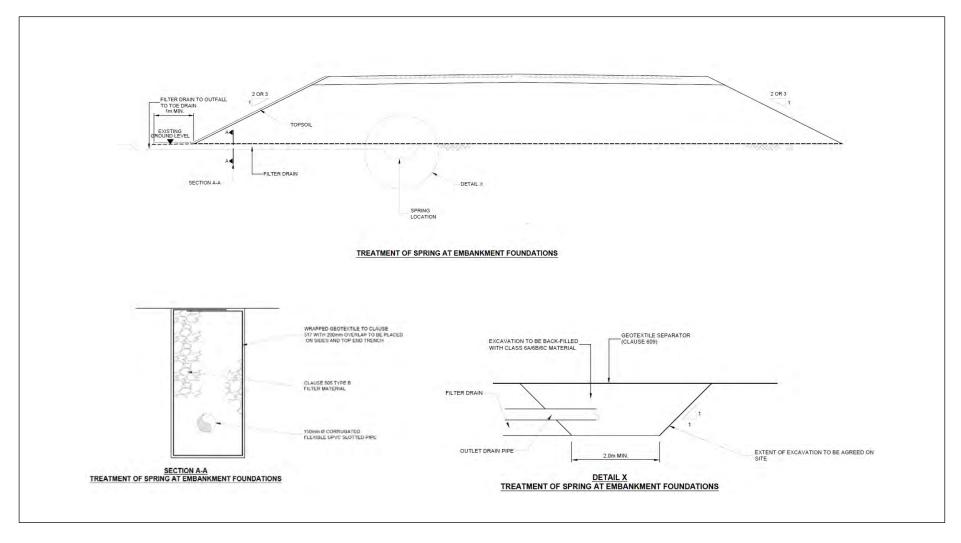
Typical detail for Treatment of Spring at Embankment Foundations
